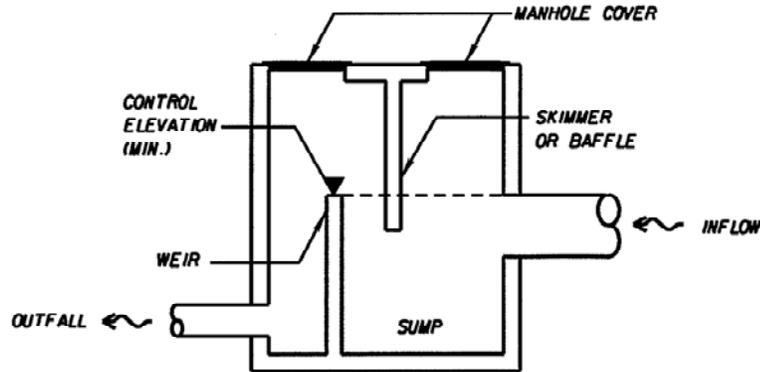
OUTFALL CONTROL STRUCTURE
